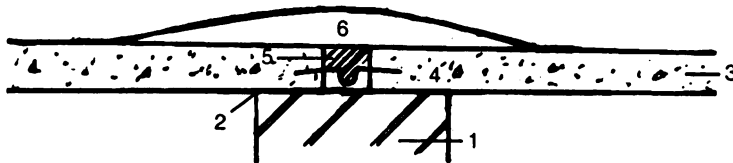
Expansion joint in slabs on walls: 1. Brickwork, 2. Kraft paper, 3. Slab, 4. Waterstop, 5. Joint filler, 6. Waterproofing.
